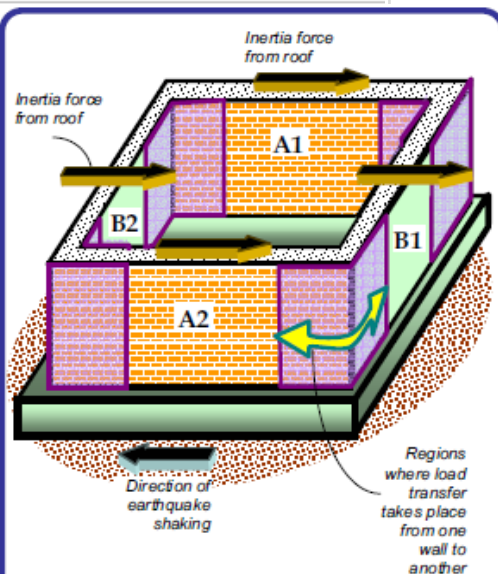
Regions of force transfer from weak walls to strong walls in a masonry building – wall B1 pulls walls A1 and A2, while wall B2 pushes walls A1 and A2.
